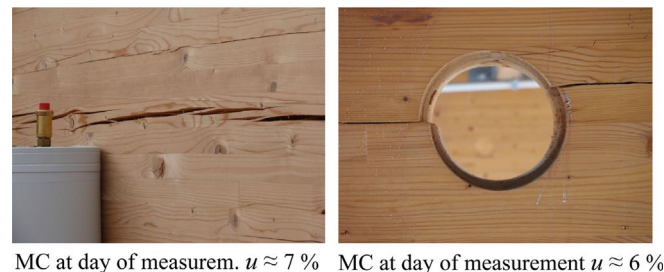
Examples of crack formation in glued-laminated timber (glulam) beams reinforced with threaded steel rods positioned perpendicular to the grain. Deep shrinkage crack (left, photo credits: Brunauer) and crack over full cross-section, leading to shear displacement in fracture plane (right).
